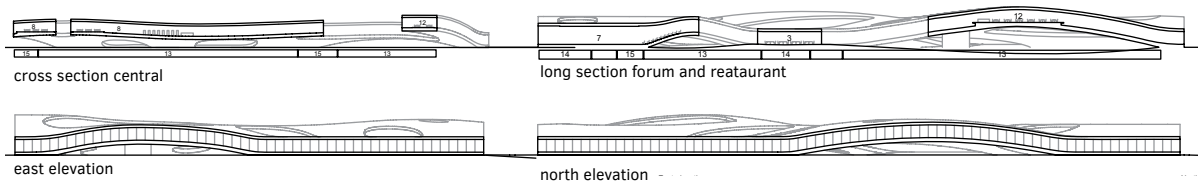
Learning Centre sections and elevations 1:1'000 (SANAA 2010)
